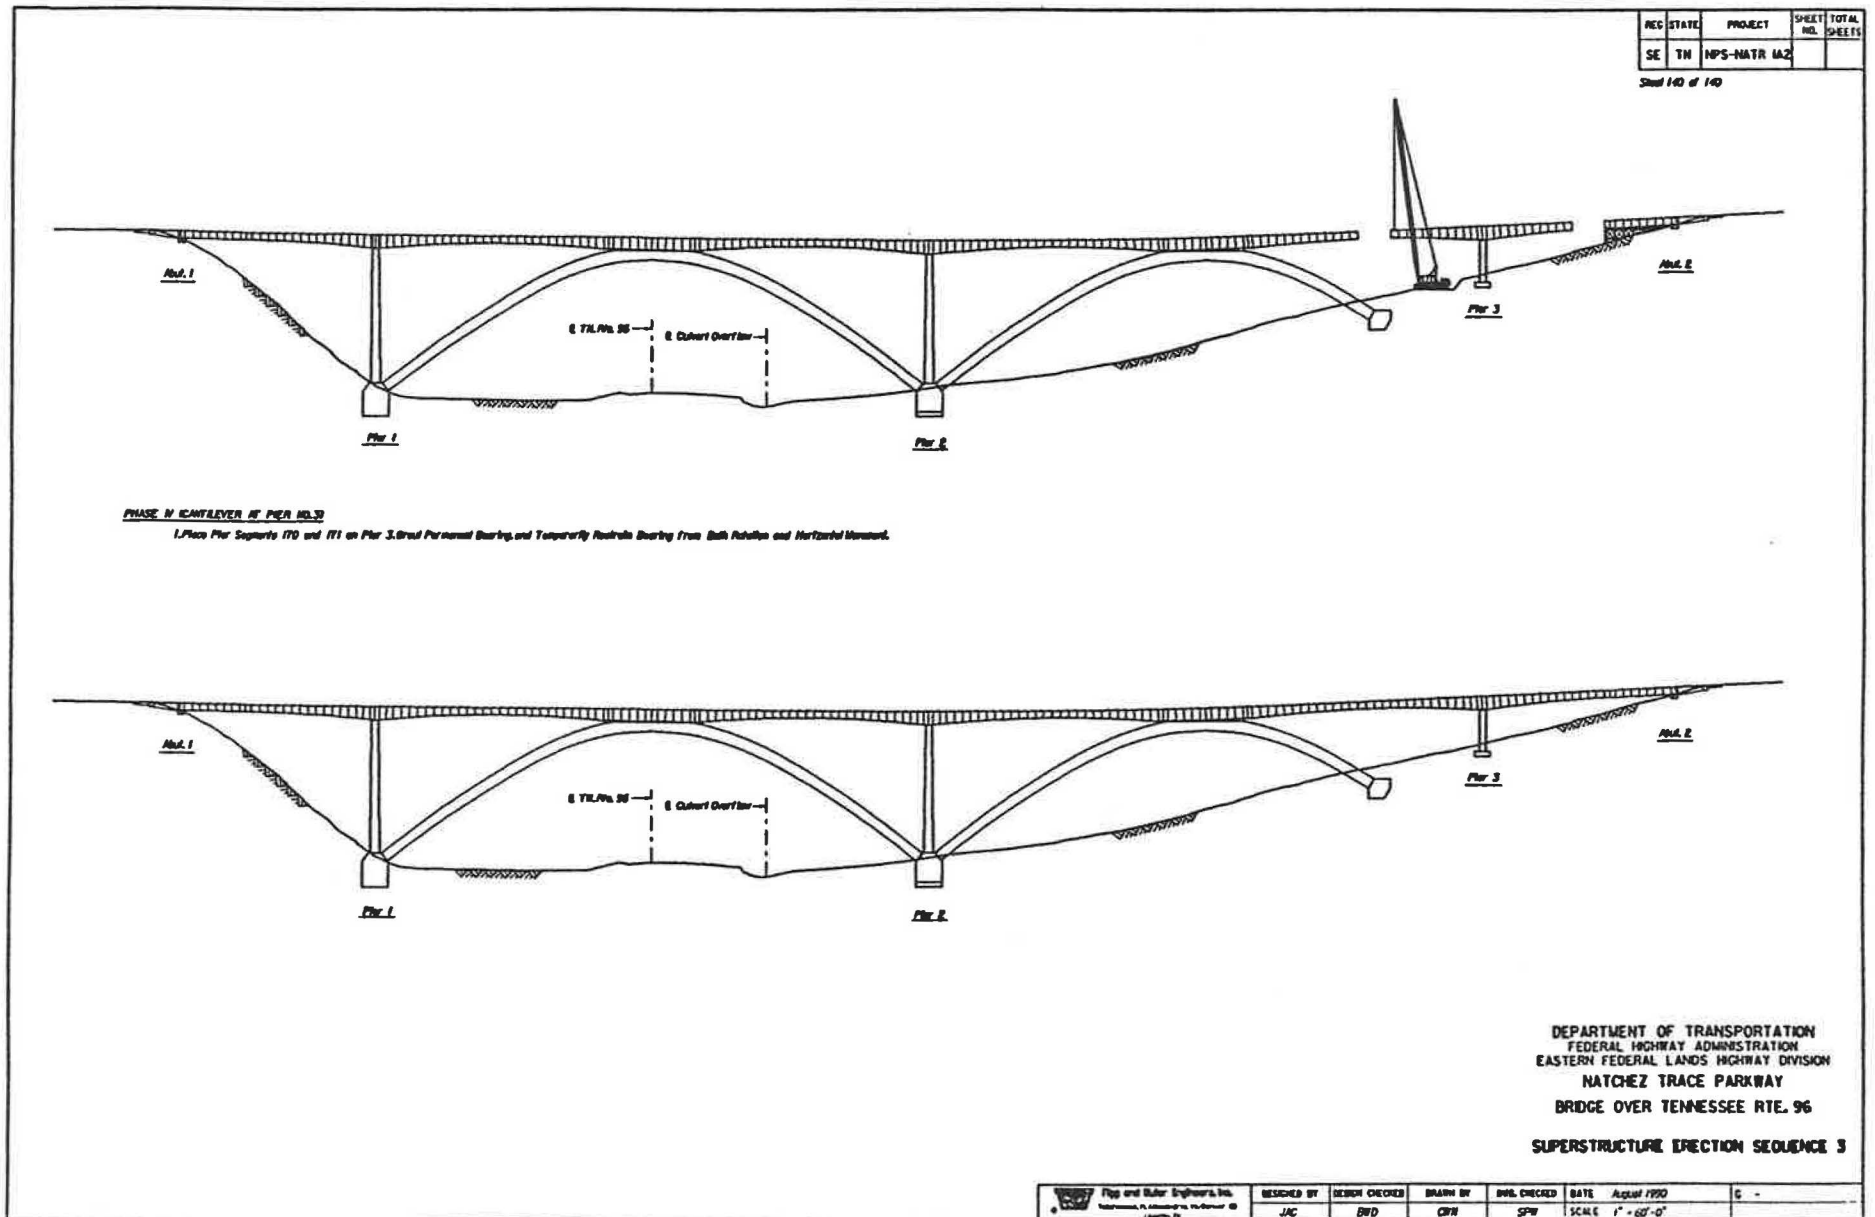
Superstructure construction - precast alternate - phases 5 and 6
